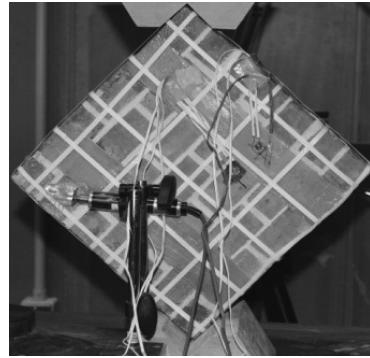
Experimental setup of a GFRP+PP-band retrofitted masonry wallet
